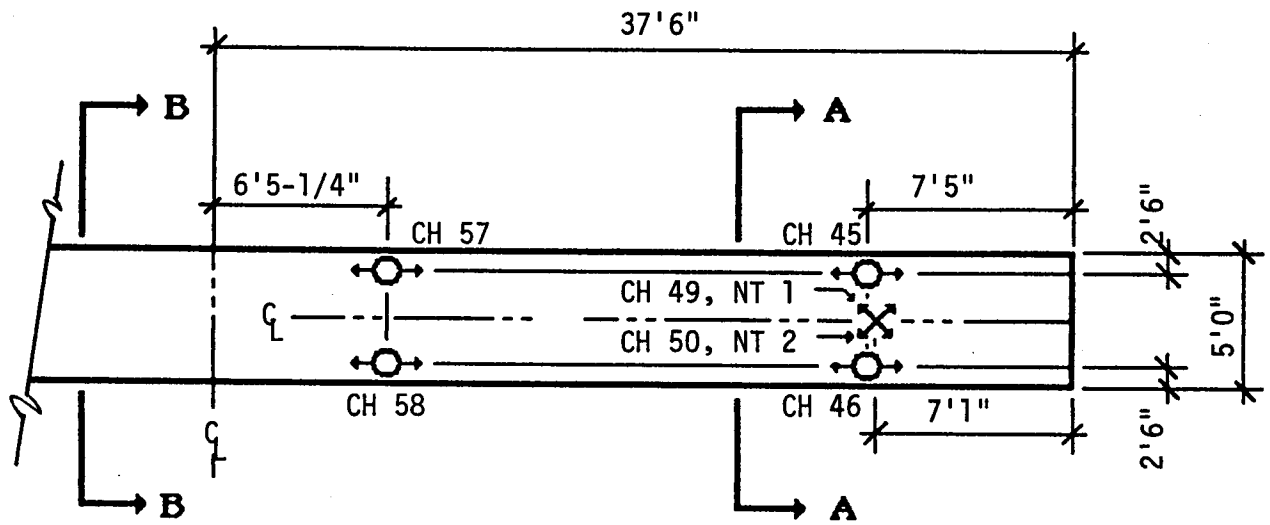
Concrete Strain Gage Layout-North Elevation
